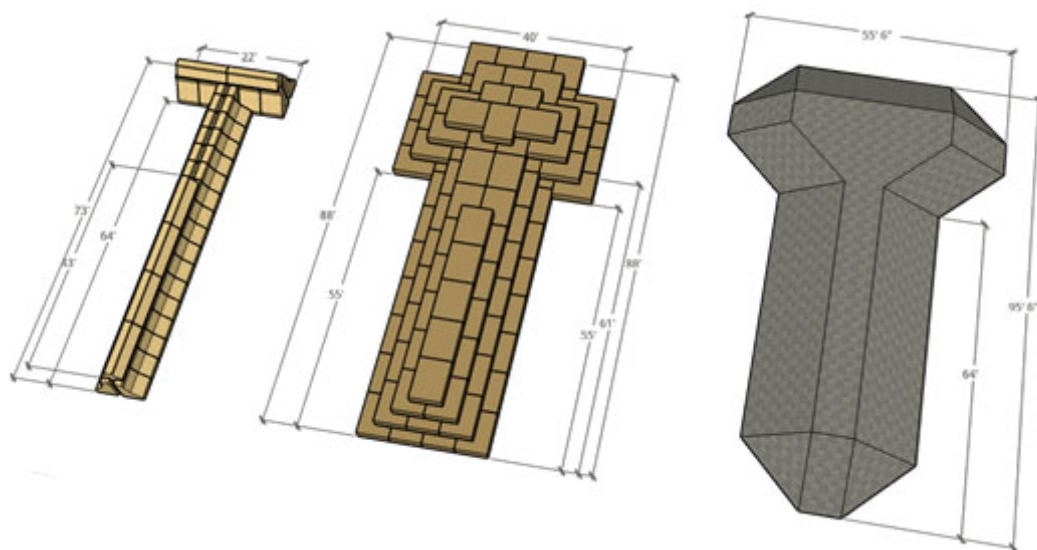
D-1. Stabilization structure construction options include: the proposed precast concrete blocks (left), sand-filled geotextile containers (middle), or a rubble mound of stone (right)
